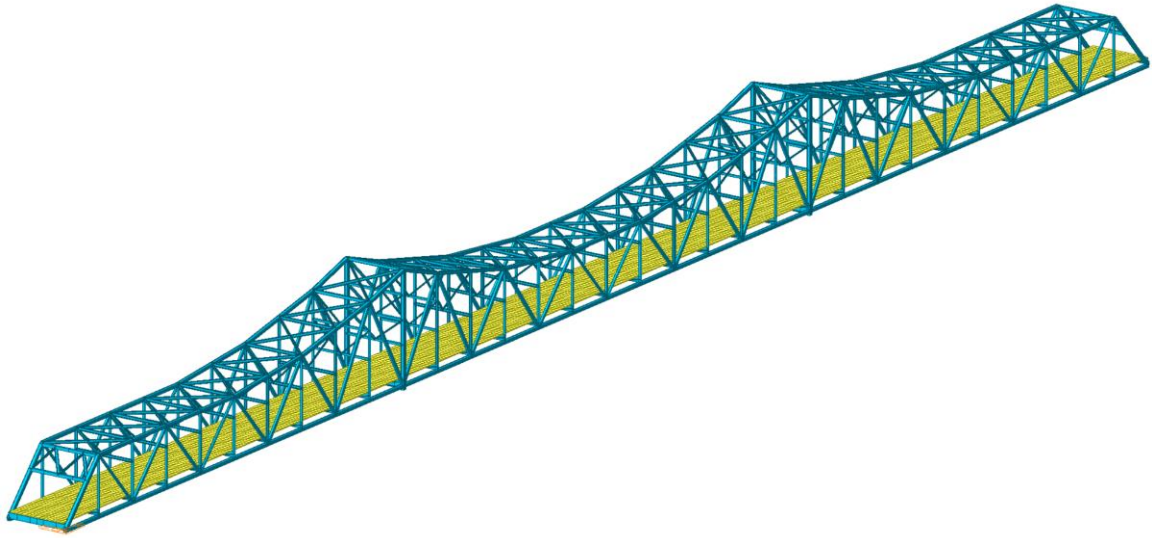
General view of the Bridge over Sipsey River main truss - FE Model.
